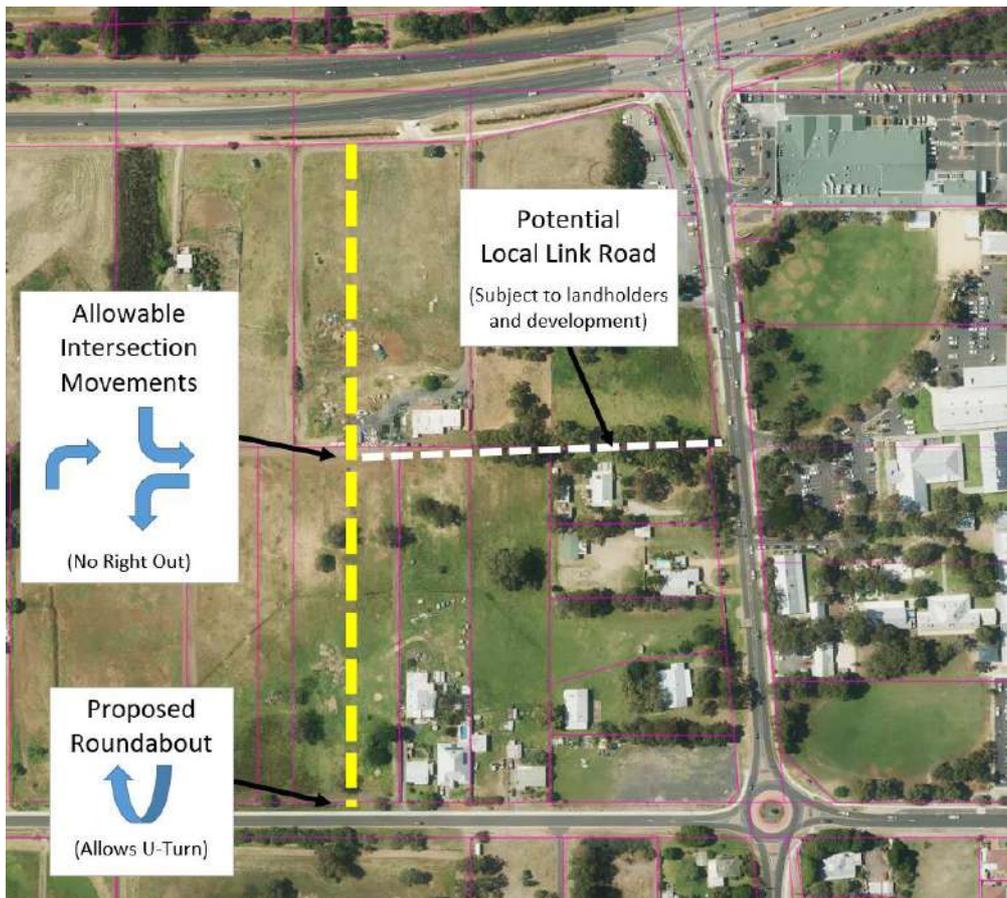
Potential Local Link Road – Allowable Intersection Movements
